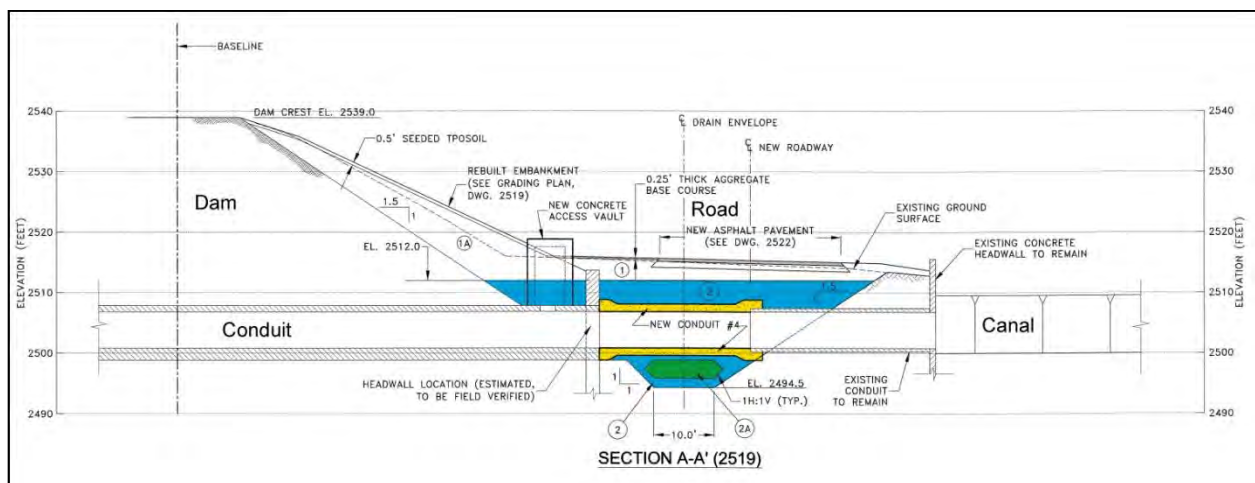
Typical filter addition around a conduit near the downstream toe of a dam.
